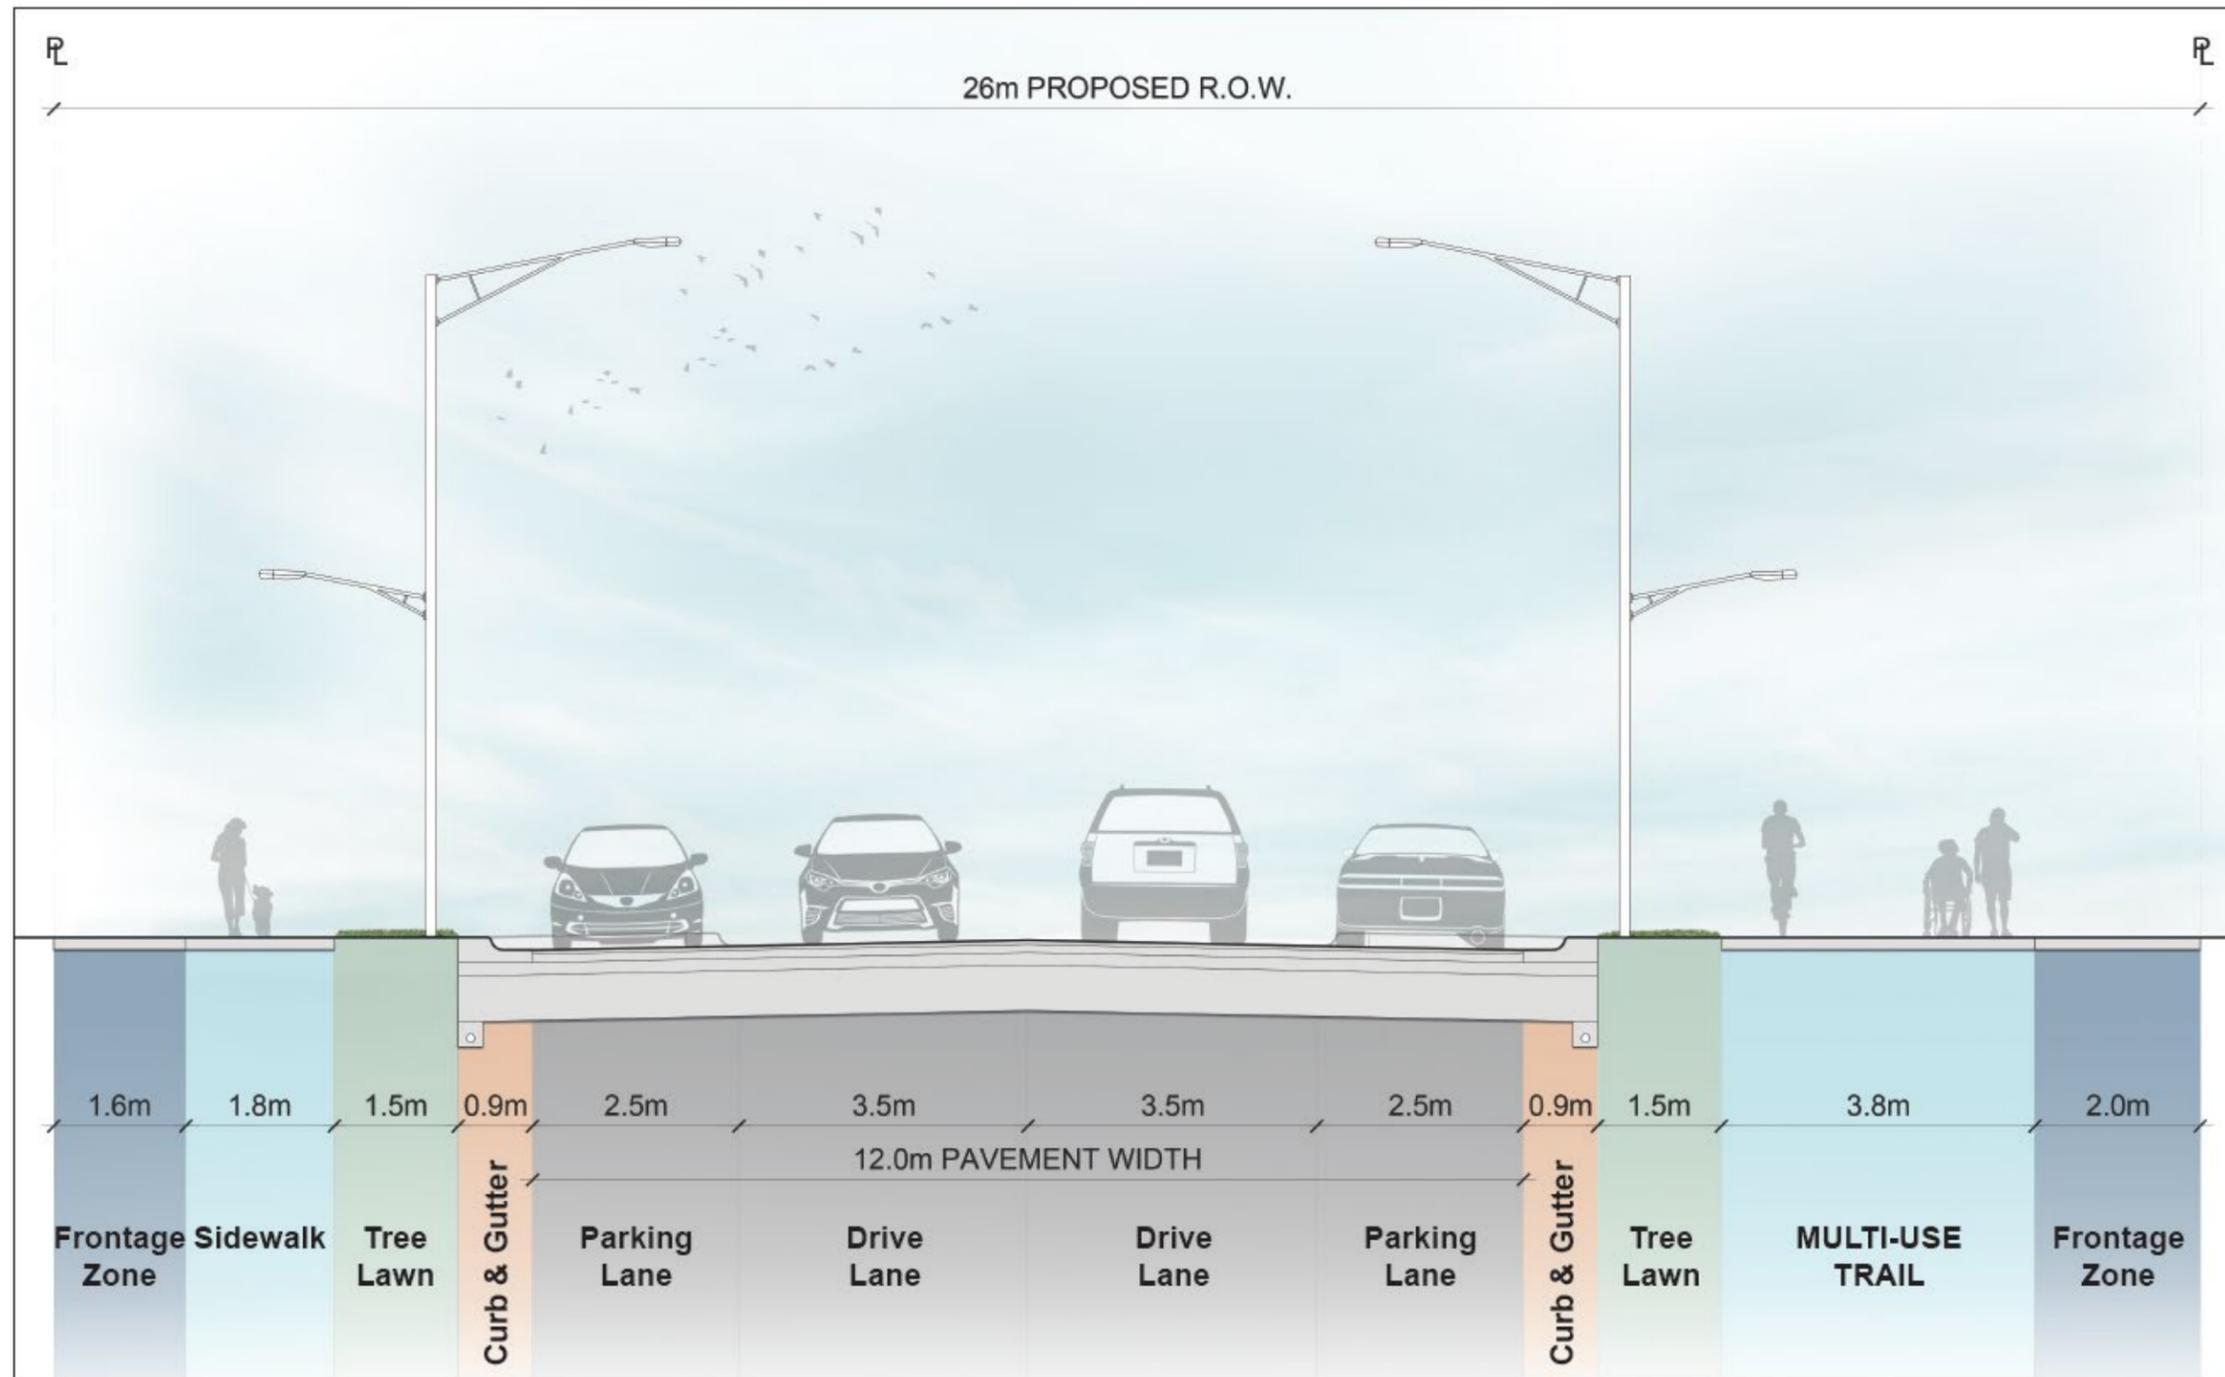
Neighbourhood Connector Street – Conceptual Application A (Retrofit)
